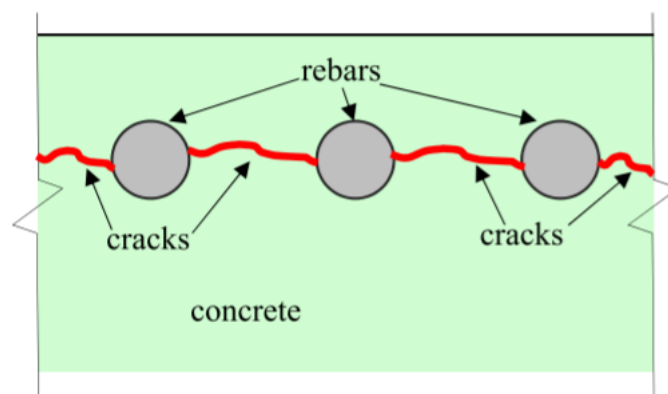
CONCRETE DELAMINATION DUE TO REINFORCEMENT CORROSION [1]
